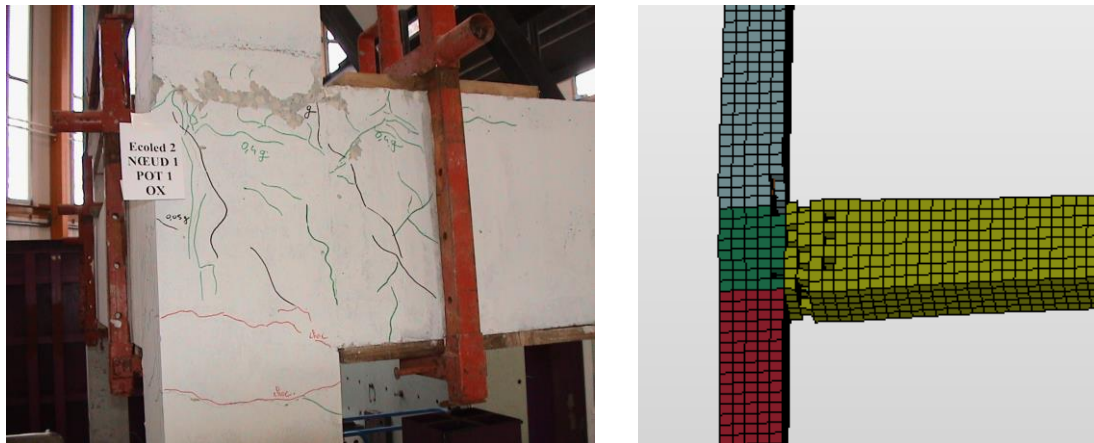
(photo on the left) cracks and spalling of concrete in the first floor's right-side beam-column connection at PGA level of 0.4g observed in the experiment, (photo on the right) resembling concrete spalling and cracking observed in the experiment using CSCM in LS-DYNA
